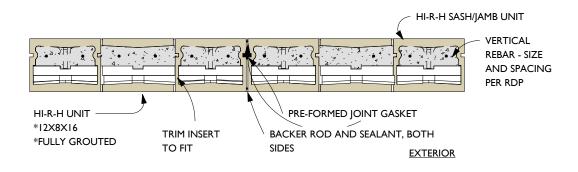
HI-R-H - Piers Control Joints and Jamb - HI-R-H Jamb Unit
